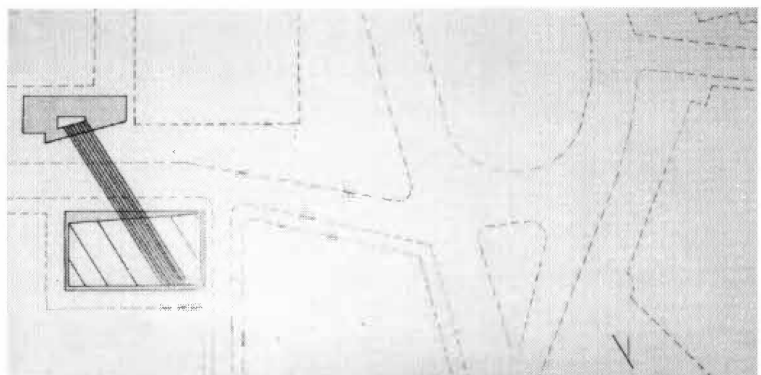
DIAGRAM - BELOW GROUND FLOOR
